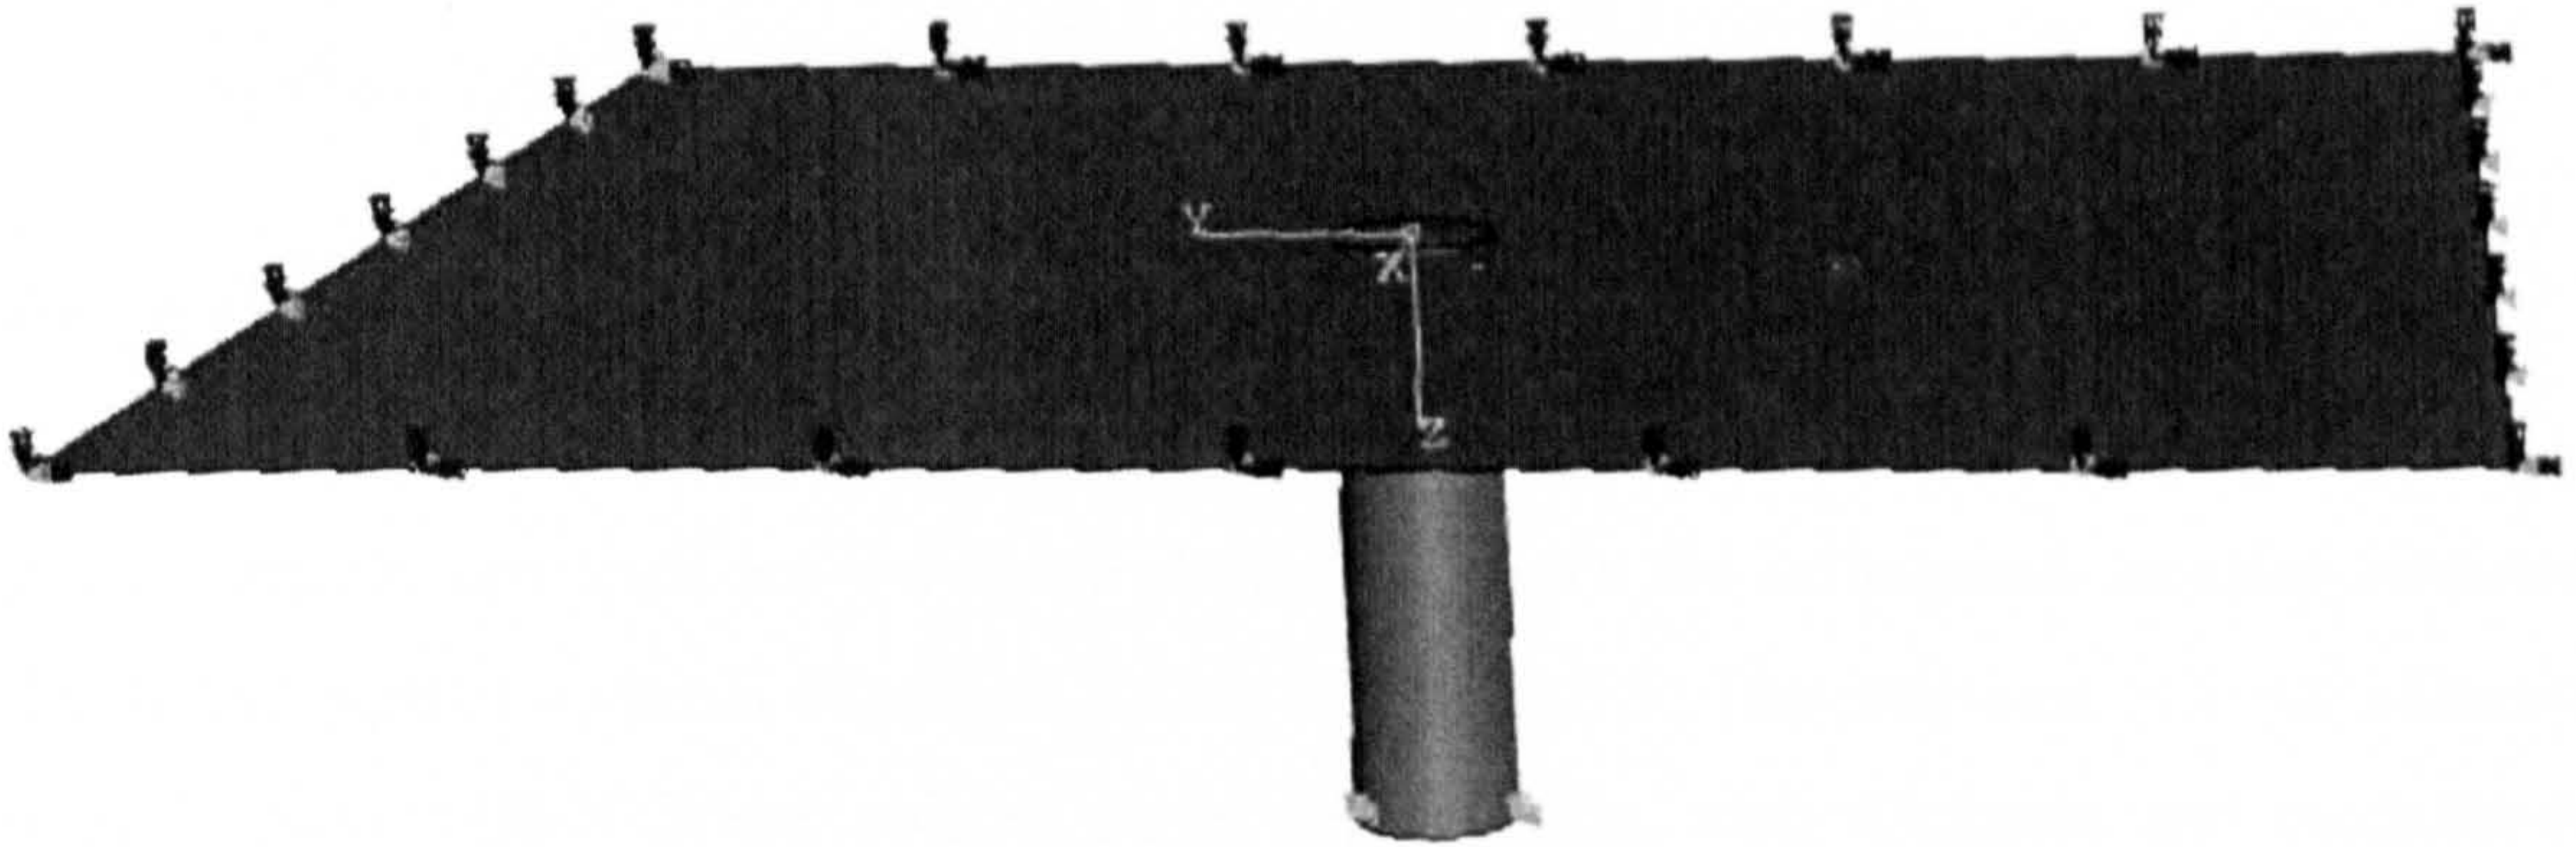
A typical slab-column connection (a single column with surrounded slab)
